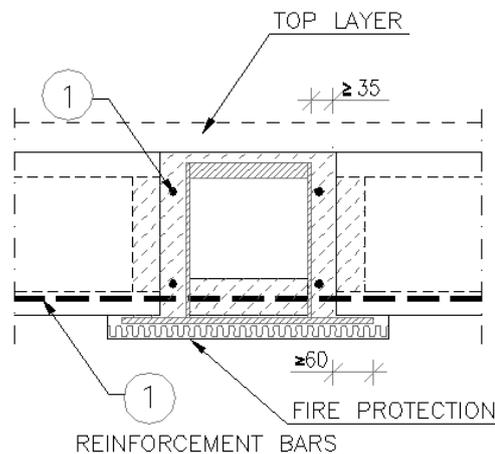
Connection between WQ-truss and hollow core slabs ([http://www.elementisuunnittelu.fi/fi/Haku?term=WQ, DO331: Ontelolaatan liitos WQ-palkkiin \(keskipalkki\)](http://www.elementisuunnittelu.fi/fi/Haku?term=WQ, DO331: Ontelolaatan liitos WQ-palkkiin (keskipalkki)))
